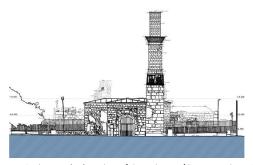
The North Elevation of Cut Minaret (Source: Asir Proje)
